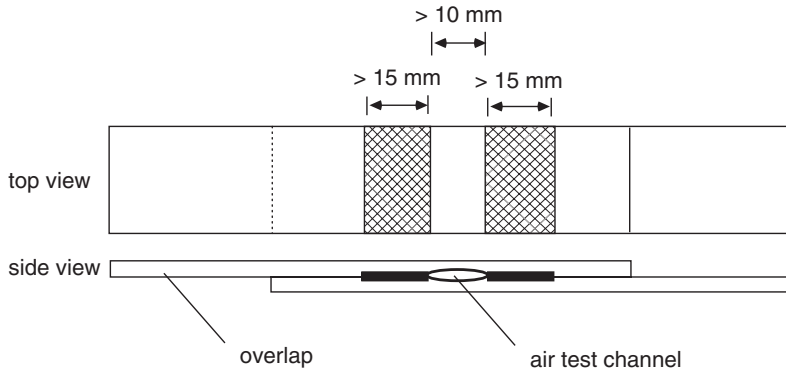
Schematic of the welding of two geomembrane sheets using a hot wedge. In hot wedge (or knife) welding a hot metal wedge is run between the two geomembrane surfaces to be seamed. Pressure is applied to the top or bottom geomembrane, or both, to form a continuous bond. Some seams of this kind are made with double weld tracks separated by a nonbonded gap. These seams are sometimes referred to as dual hot wedge seams or double-track seams. Reproduced by permission of Barry Smith, Plastic Welding Division, Plastral Pty Ltd
